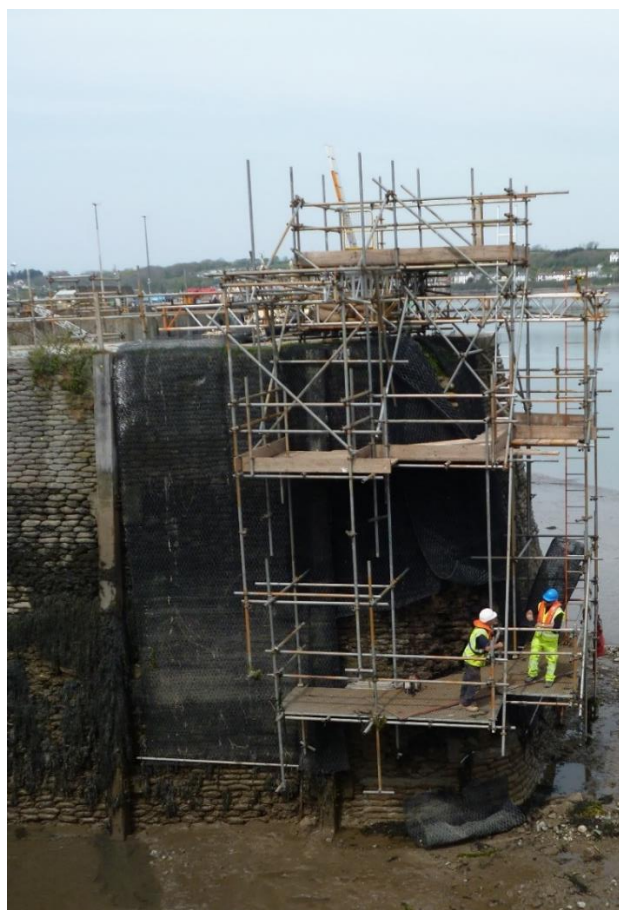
Negative Mobile Elevated Working Platforms (MEWP's) to repair walls from above high water
